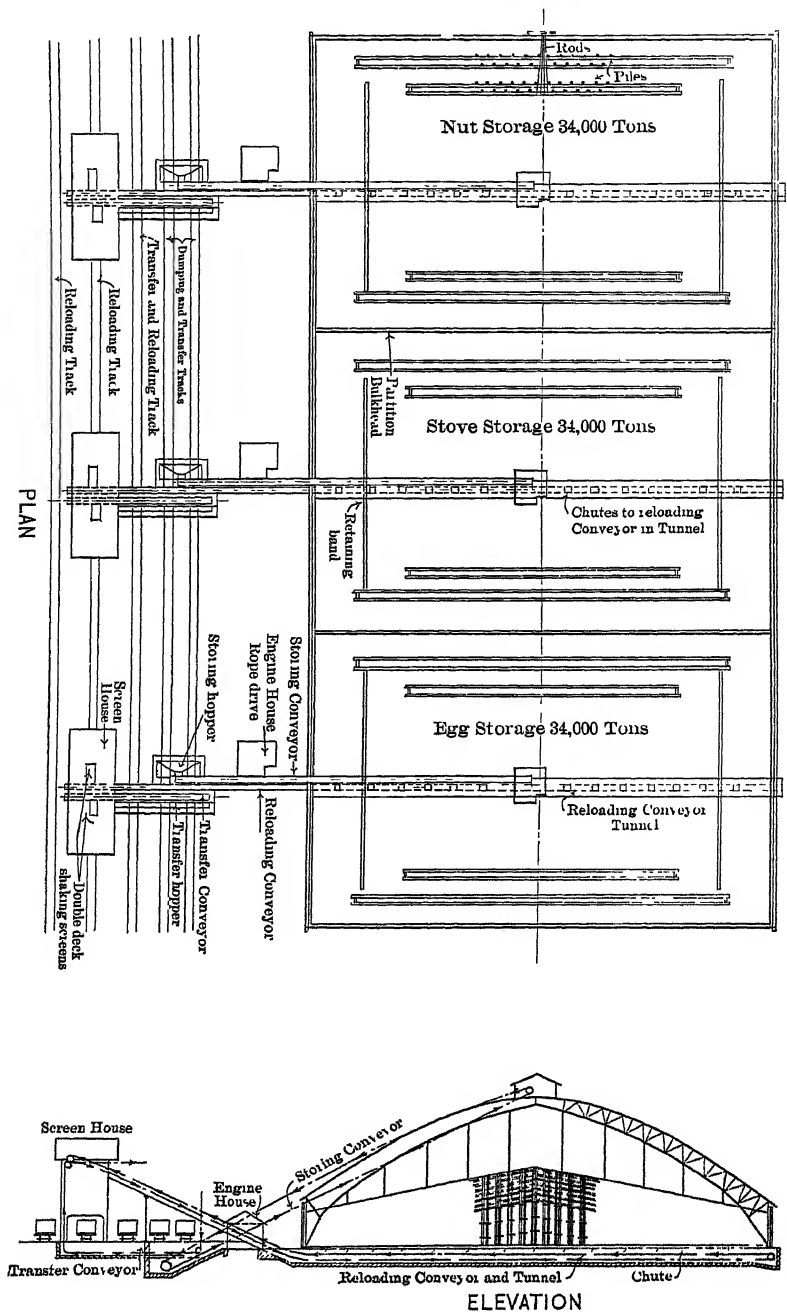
WENDE STORAGE-PLANT, LEHIGH VALLEY COAL CO., BUFFALO, N. Y. PLAN AND ELEVATION.
